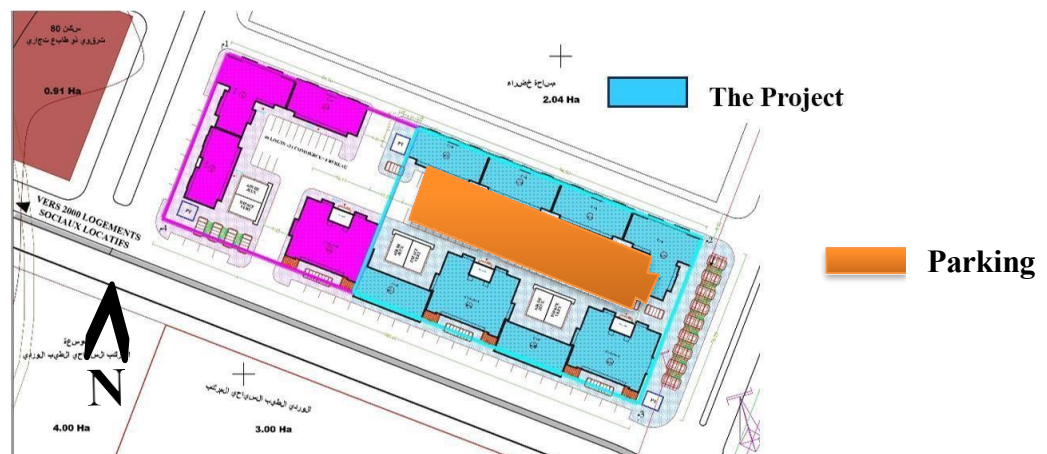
Placement of Buildings on the Site (Source: design office Nebar Omar +Author treatment , 2025).
